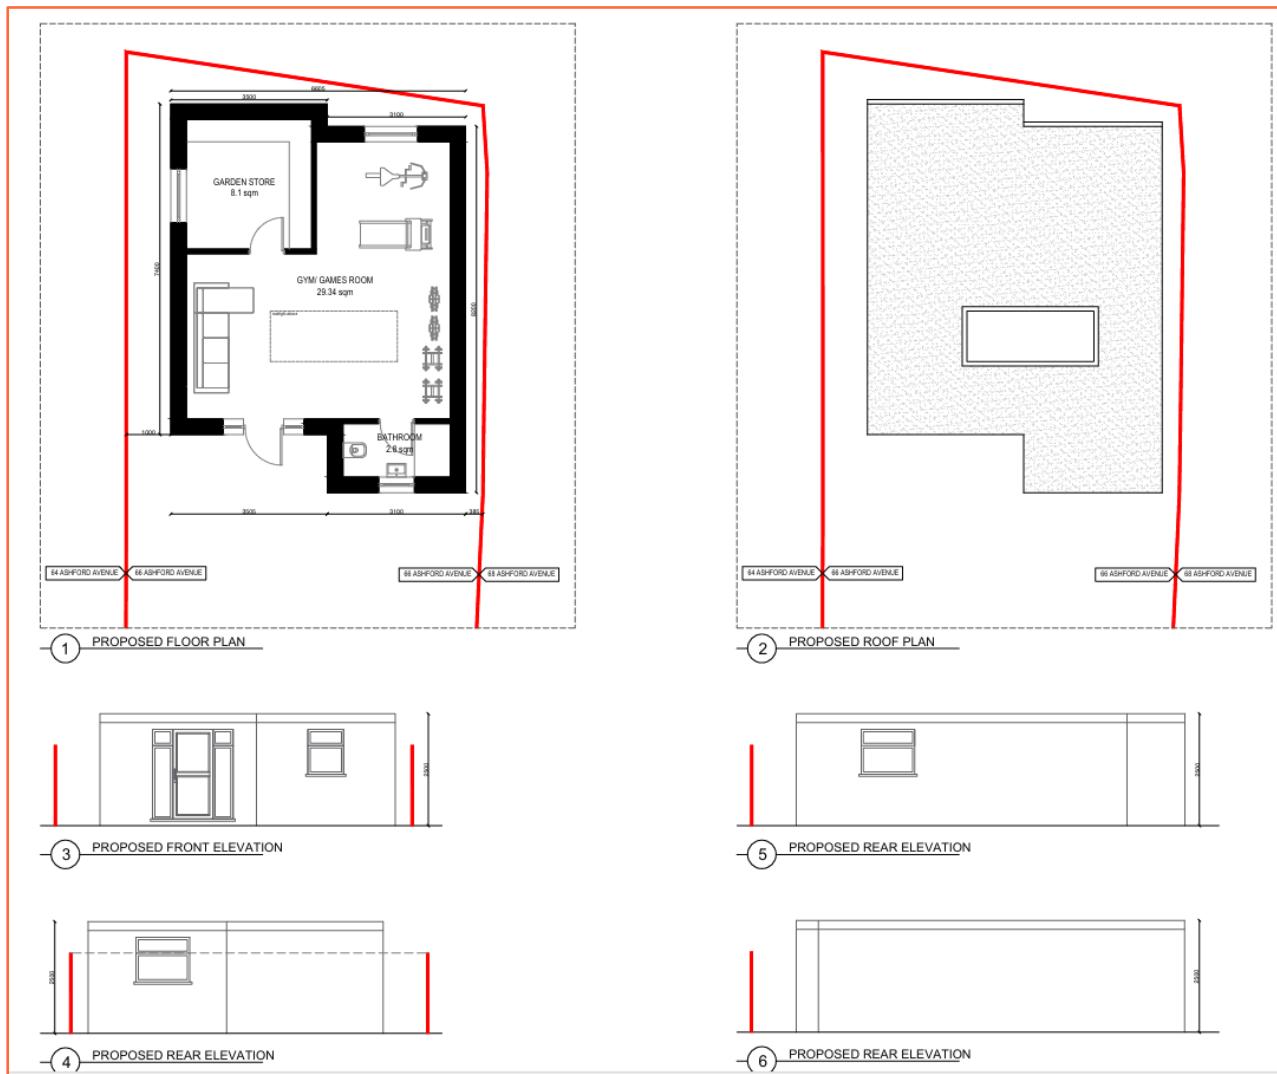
Proposed floor and roof plan for the outbuilding (Source: AMBA Architecture)
